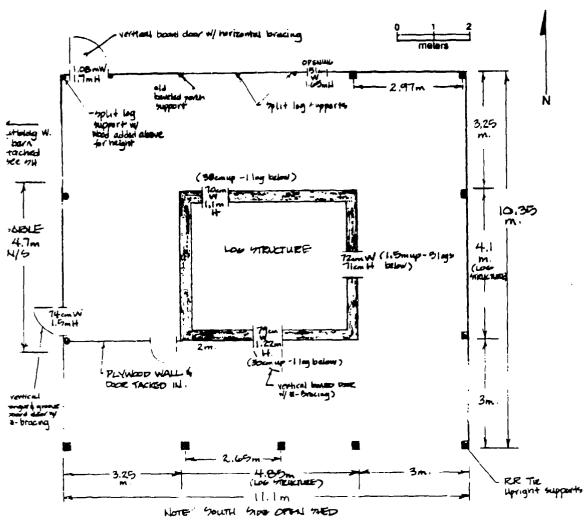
Field architectural floorplan of the porch to the dwelling at 41DN165.
